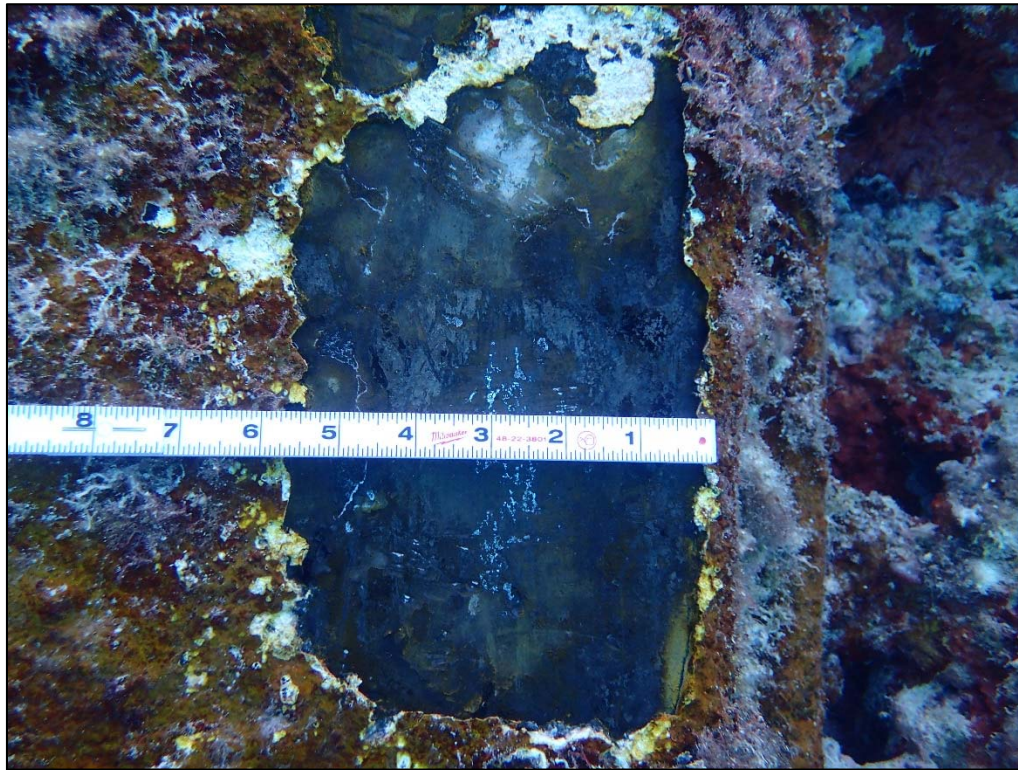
Cleaned section of sheet pile flange at Station 0+20, front face of Berth 2.
